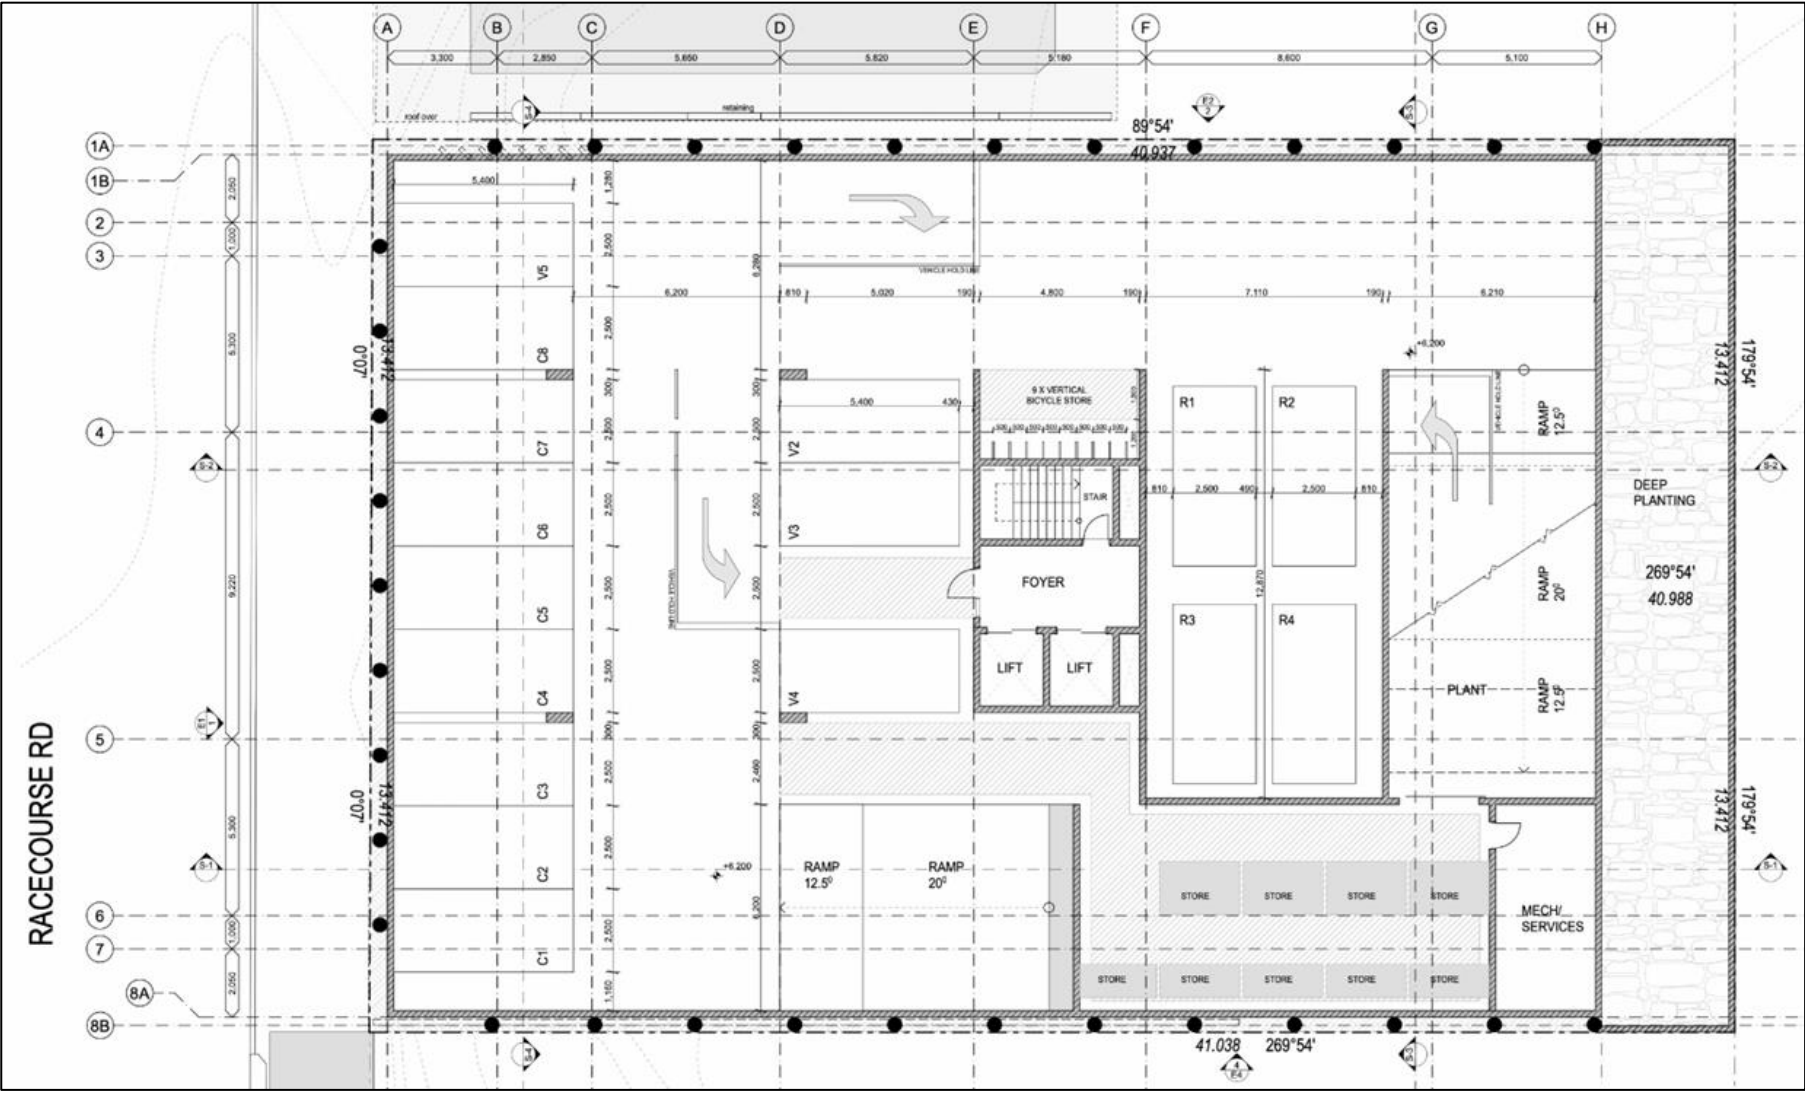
PROPOSED BASEMENT ONE FLOOR PLAN
